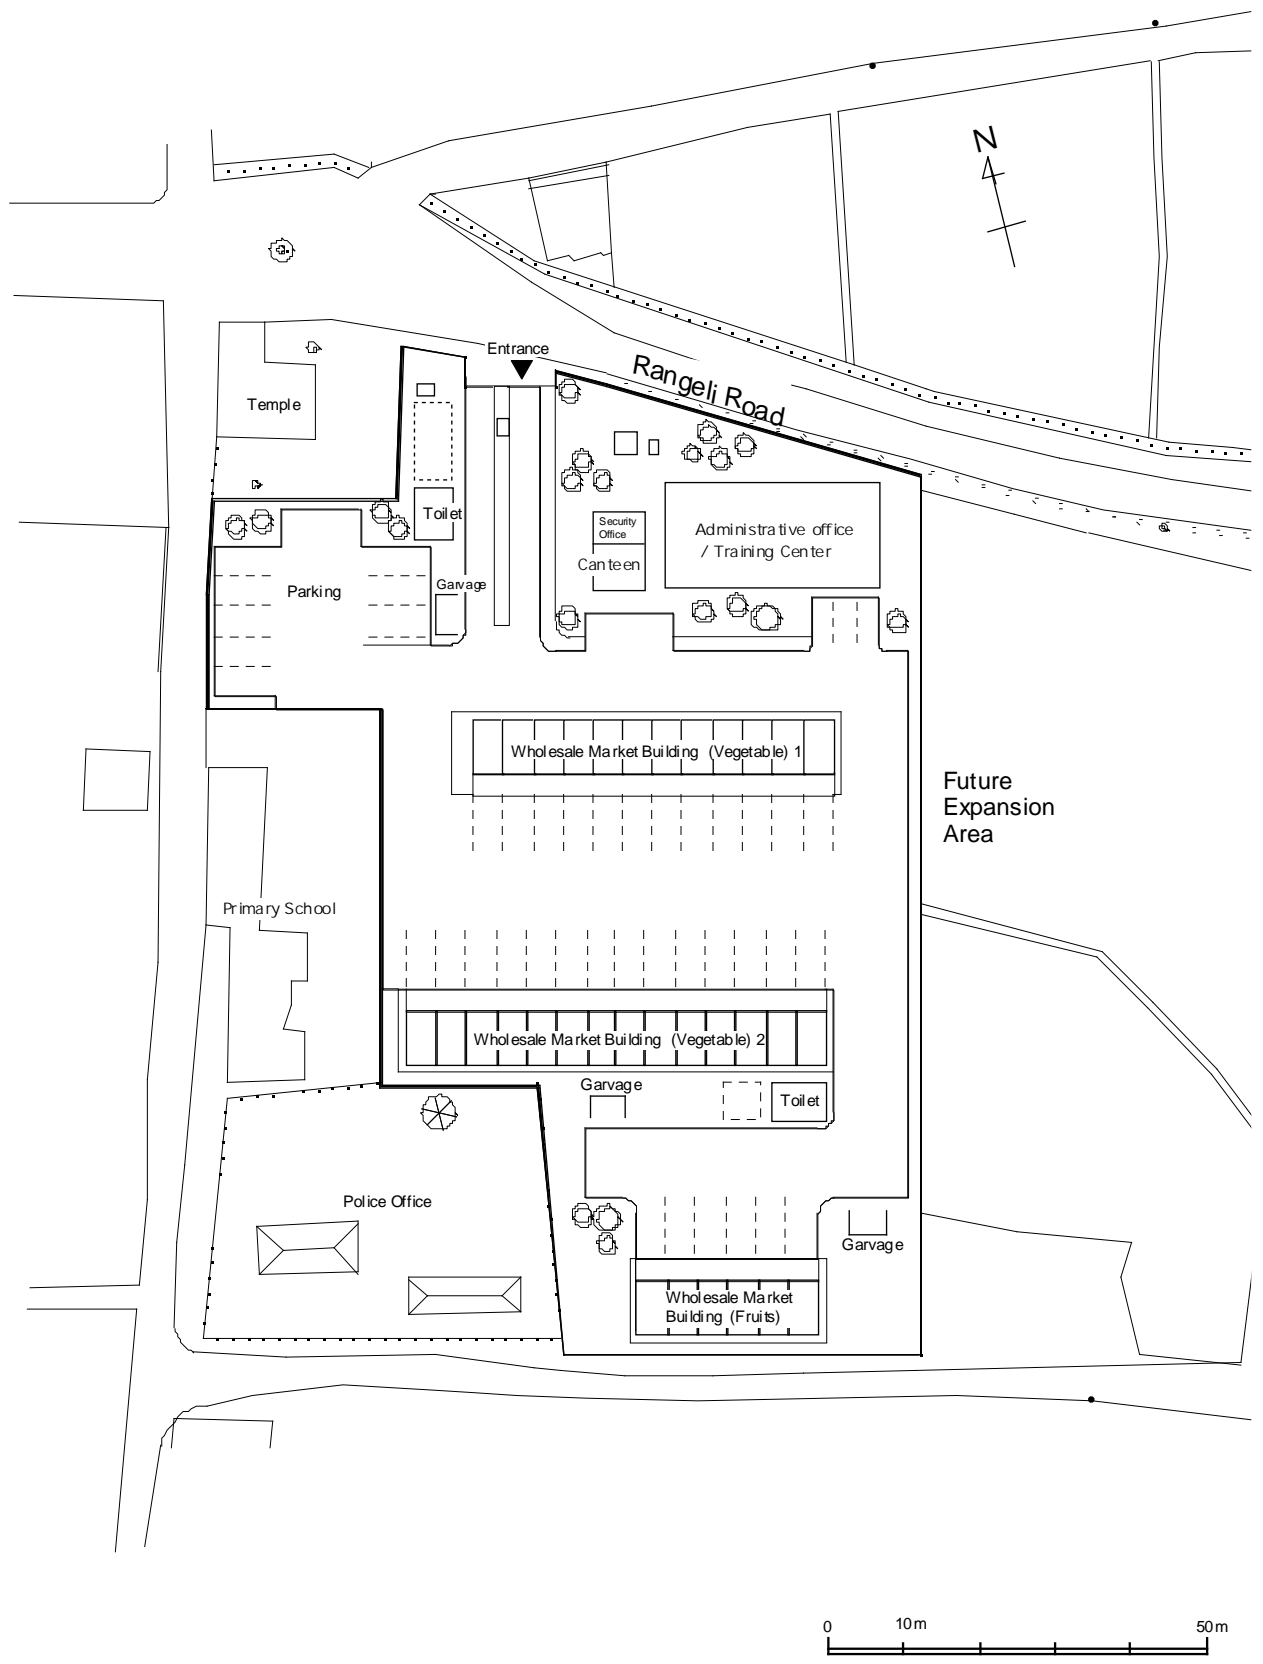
Layout Plan of NWM in Site 1, Biratnagar
